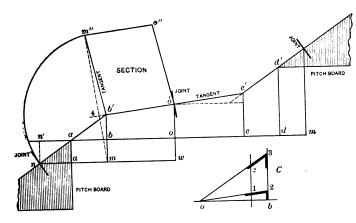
Elevation of Steps and Pitch of Tangents.
